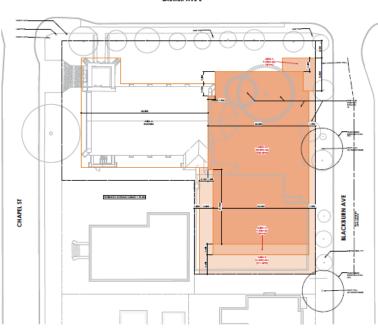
A landscape plan illustrating the south boundary. Source Stantec 2024.
